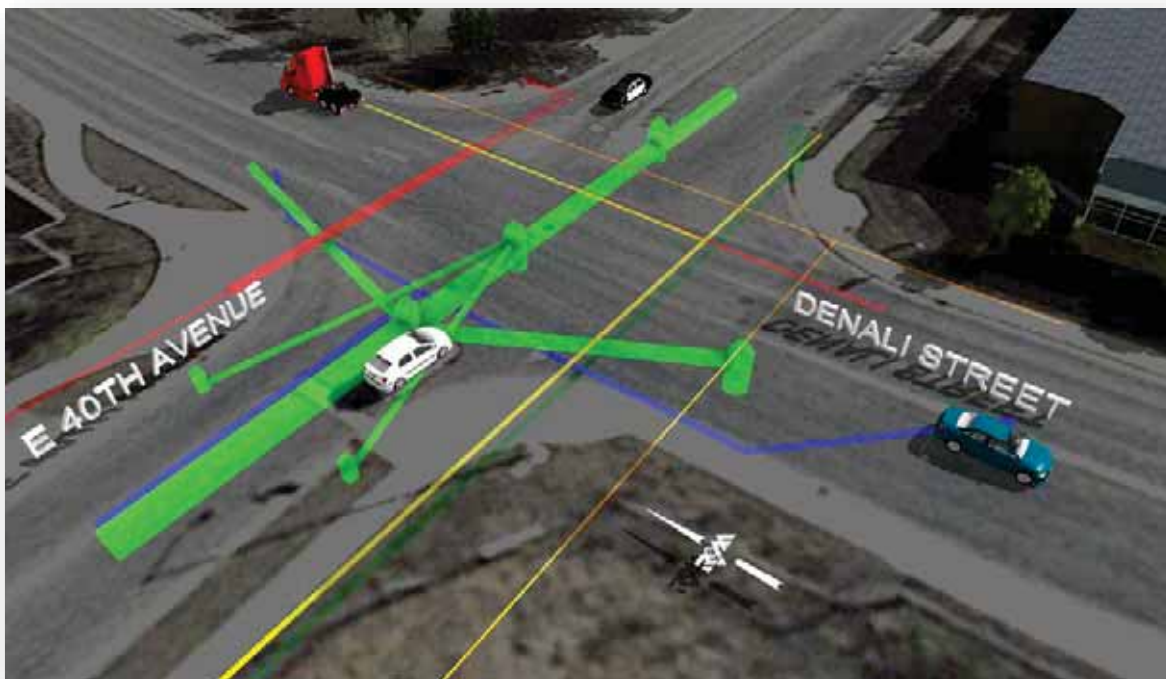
Existing underground utilities at Denali Street and East 40th Avenue
